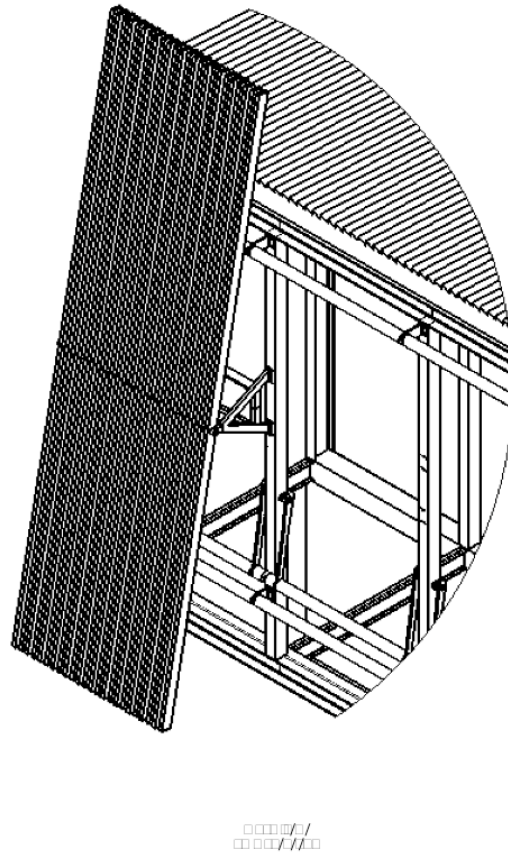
Excerpt from engineering drawings of kinematic pendulum façade structural support, showing limit bumpers, axle truss and locking mechanism. (O. Spjeld, LLO)
